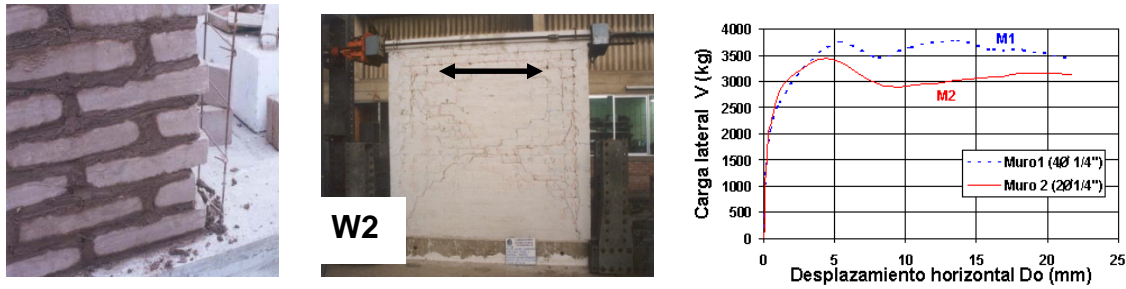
Lateral Load Test and Envelope V-D (Angel San Bartolomé, 2003).
